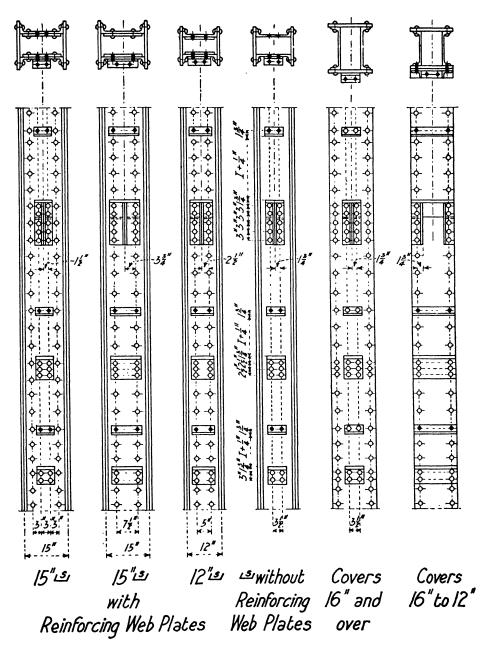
DETAILS OF COLUMNS. AMERICAN BRIDGE COMPANY.
